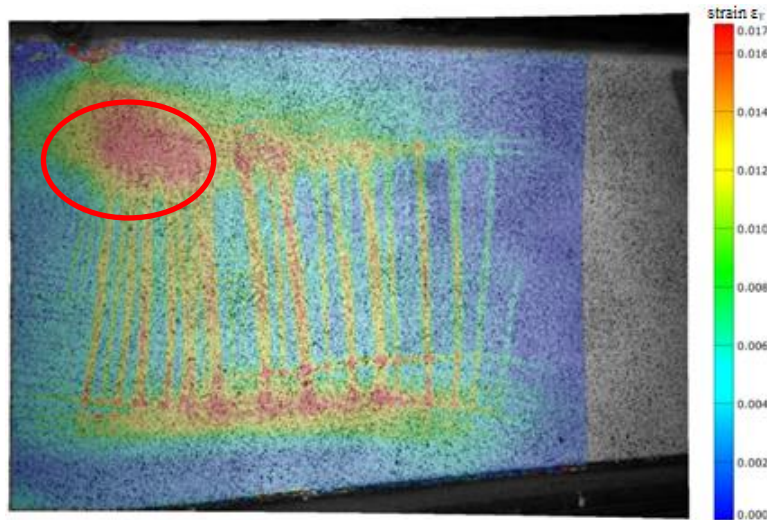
True Major Strain Field of Specimen 9-W16-L at 77 kips of Loading Before Failure
